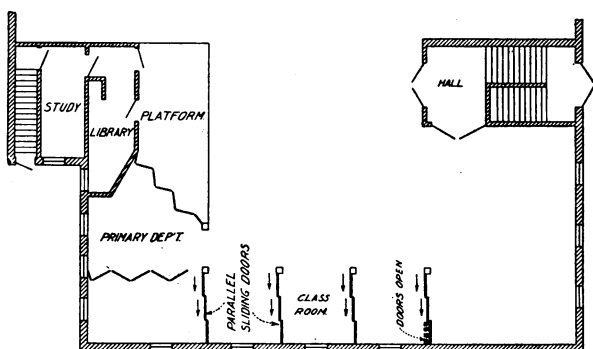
PLAN OF SUNDAY SCHOOL PORTION OF THE CHURCH
